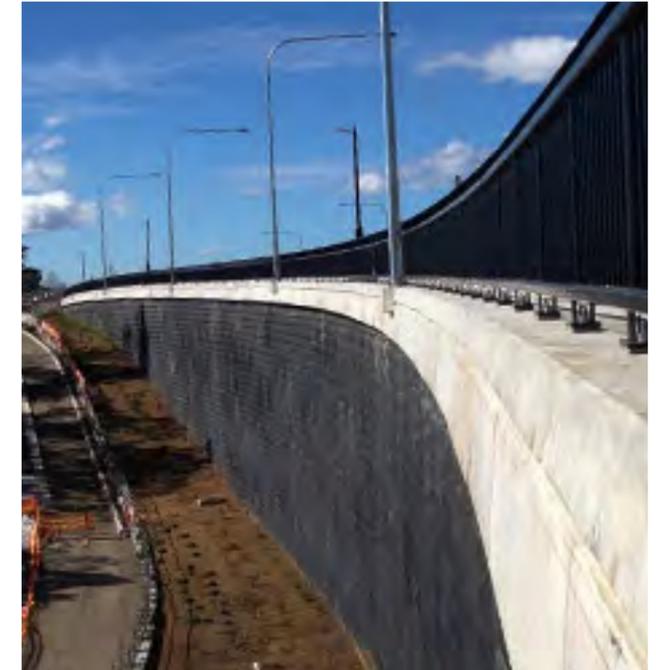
This section of the Great Western Highway at Woodford to Hazelbrook illustrates the typical treatment for retaining walls facing away from the highway.
